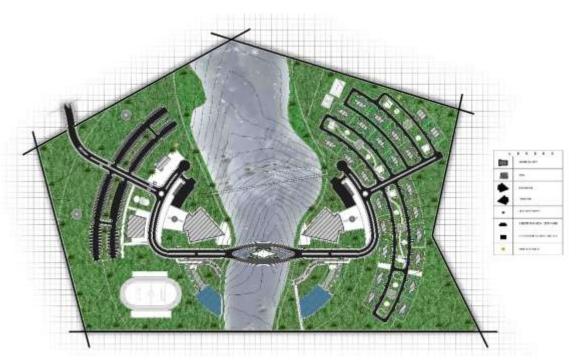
Proposed site plan for the Gurara tourist centre Source: Author's work, (2021)
